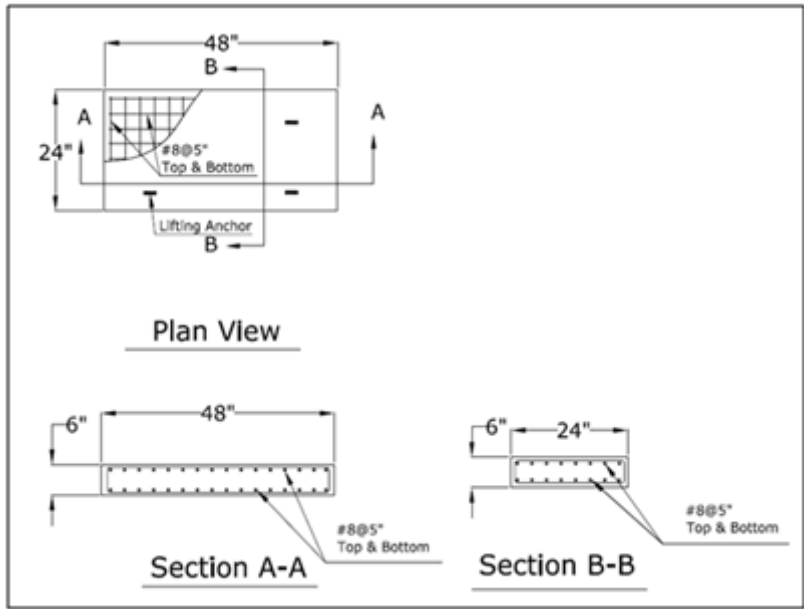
Slab Layout for 24in. (61 cm) Pipe
